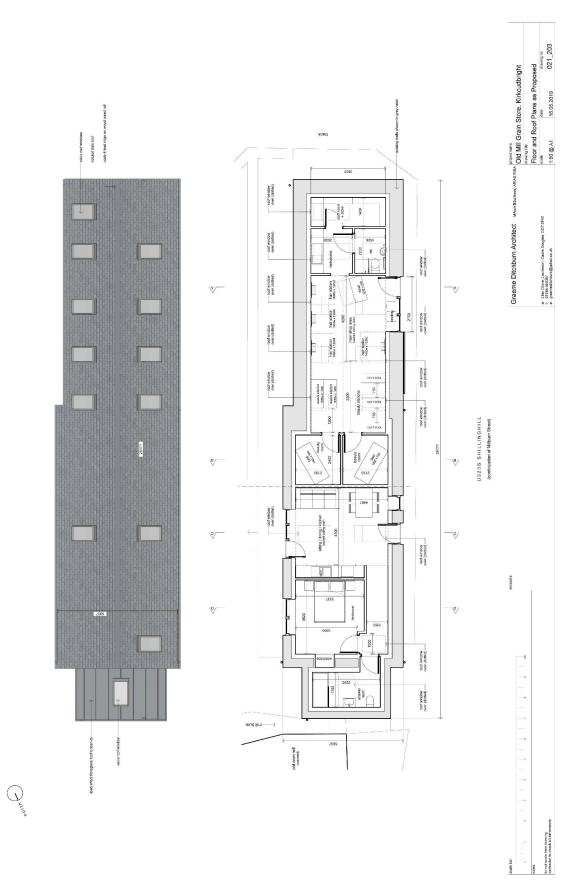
proposed roof & floor plans (kindly provided by Gary Mckeand) (c) Graeme Ditchburn Architect
